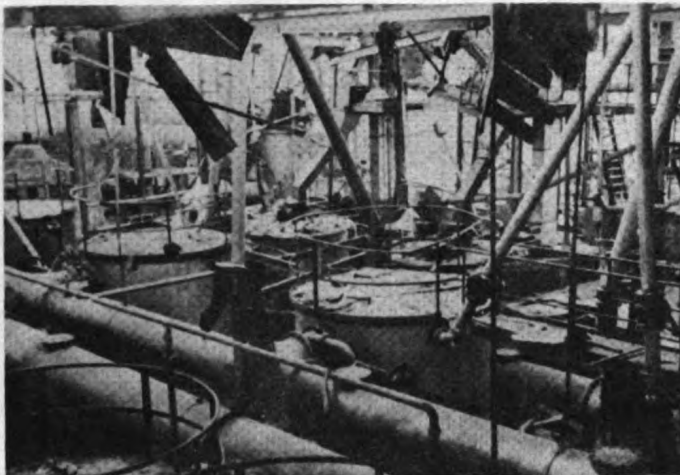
View showing superficial damage to Bldg. K - gas generating building. Very little damage was sustained by the equipment.
